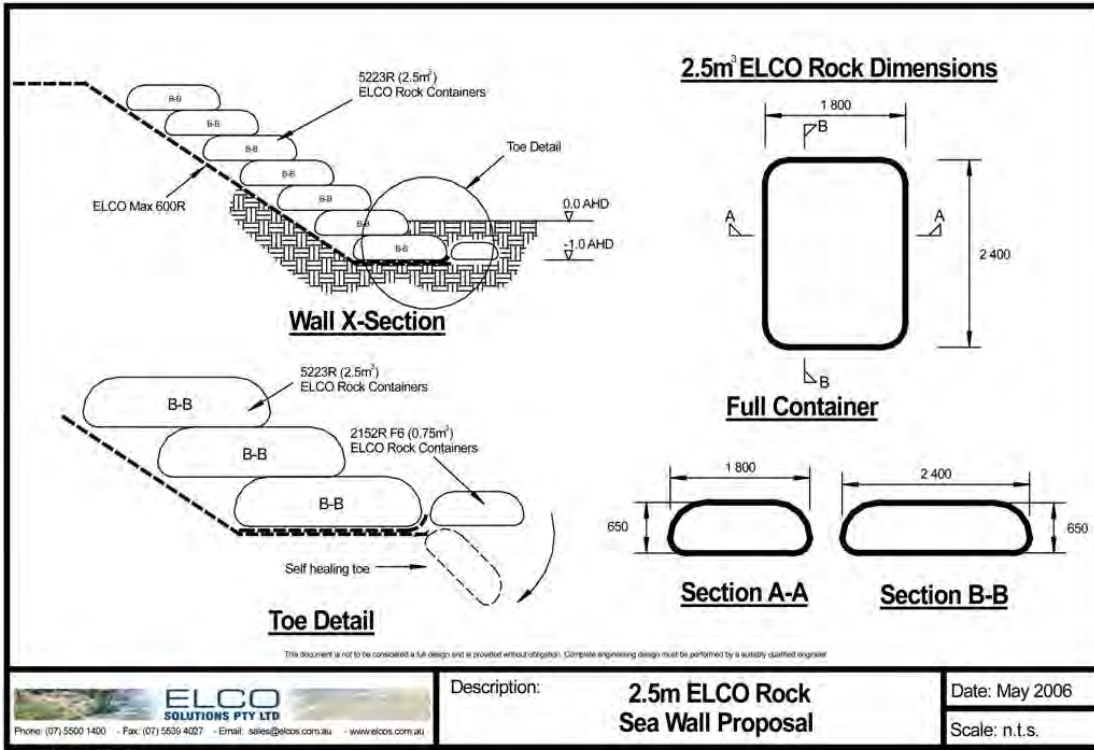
ELCORock dimensions for 2.5 m³ bag and revetment cross section (source: ELCO Solutions)
